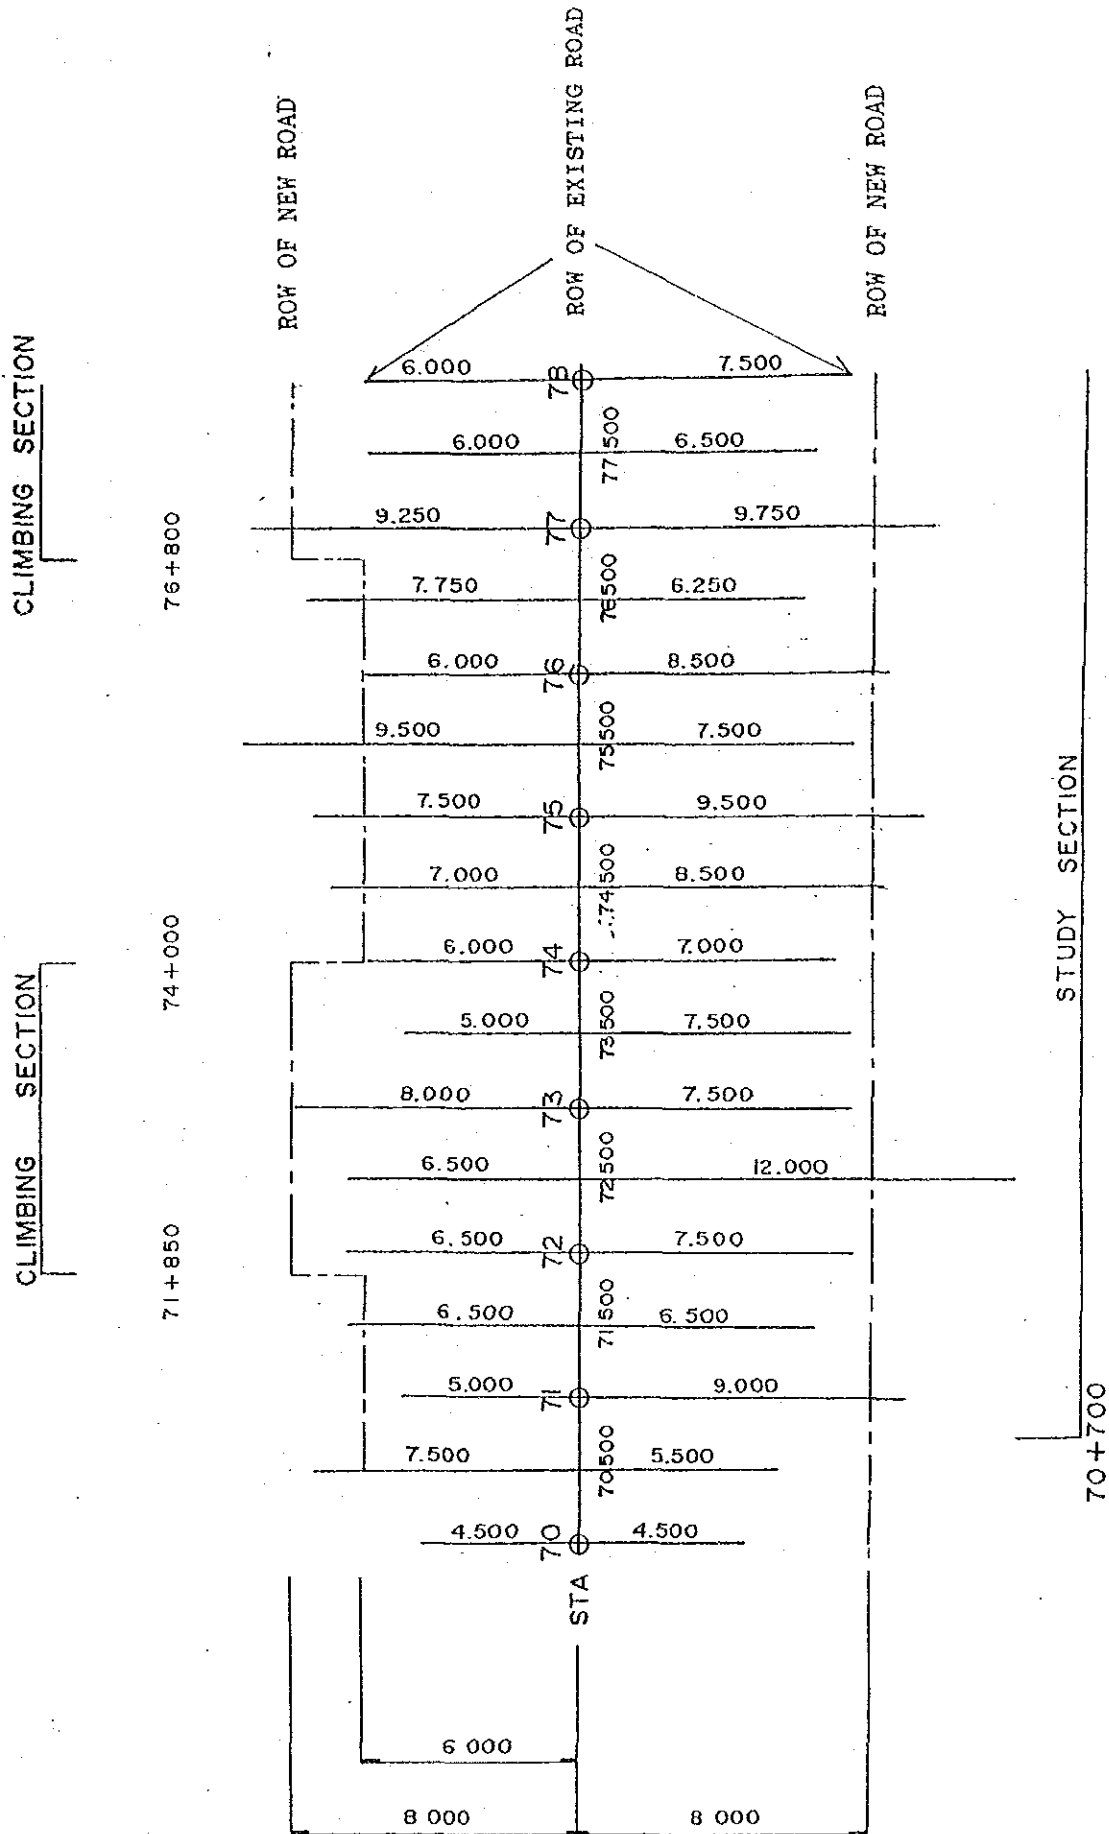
A Standard Section and Climbing Section (A)
